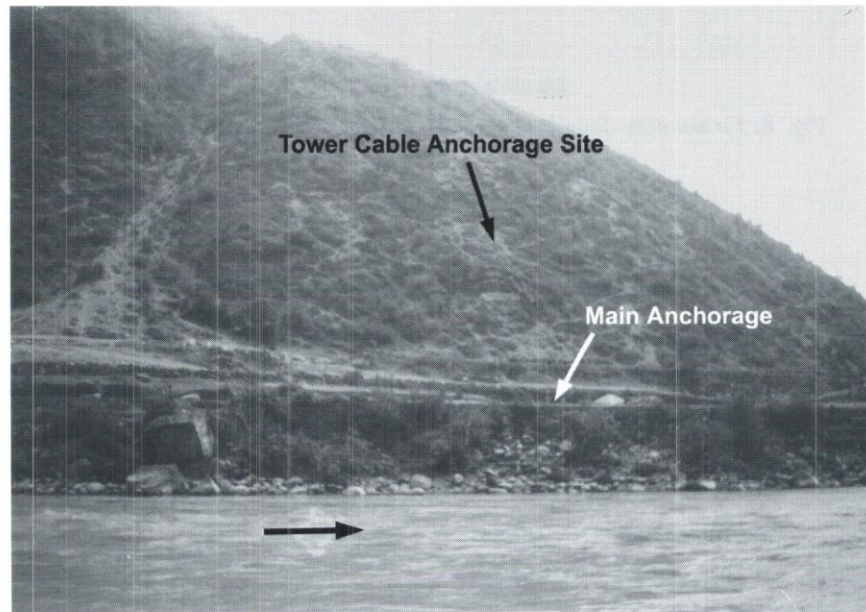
Tower cable anchorage site of left bank at stable rocky upslope
